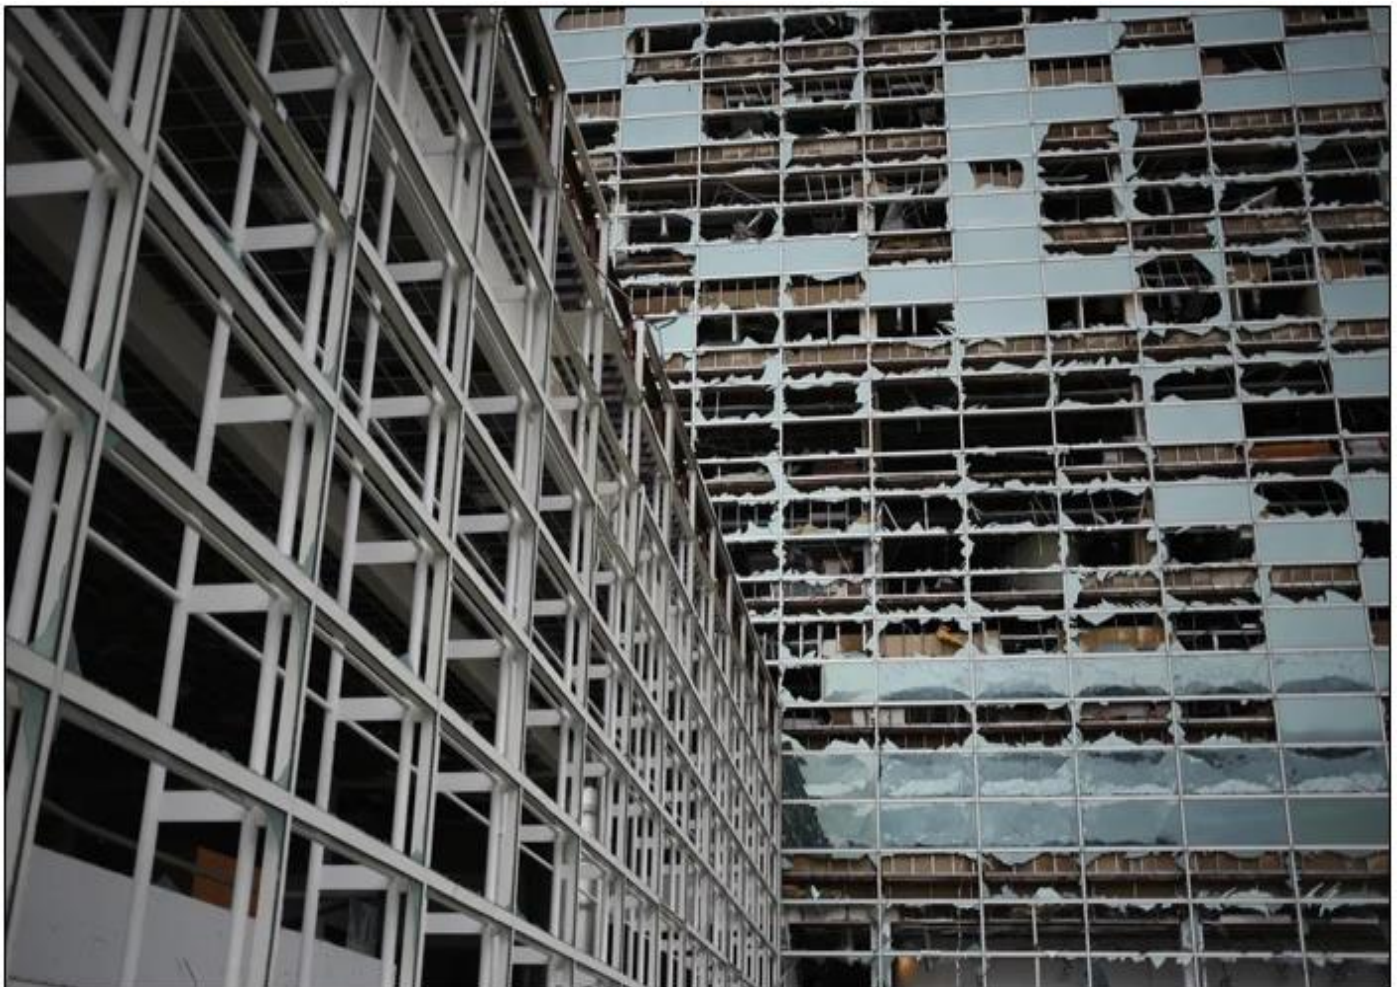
Damage to Capital One Tower in the aftermath of Hurricane Laura (Surane, 2020)
